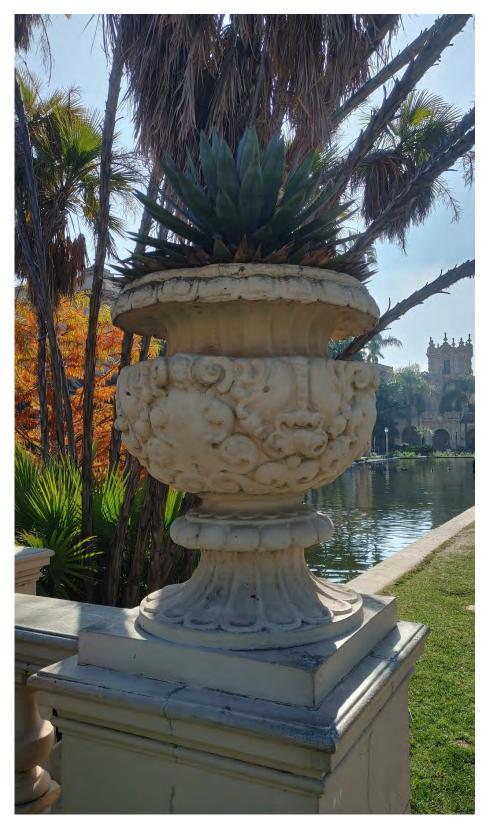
Urn atop structurally damaged southwestern pedestal, facing southeast. Photo credit: Elizabeth Herlihy.
